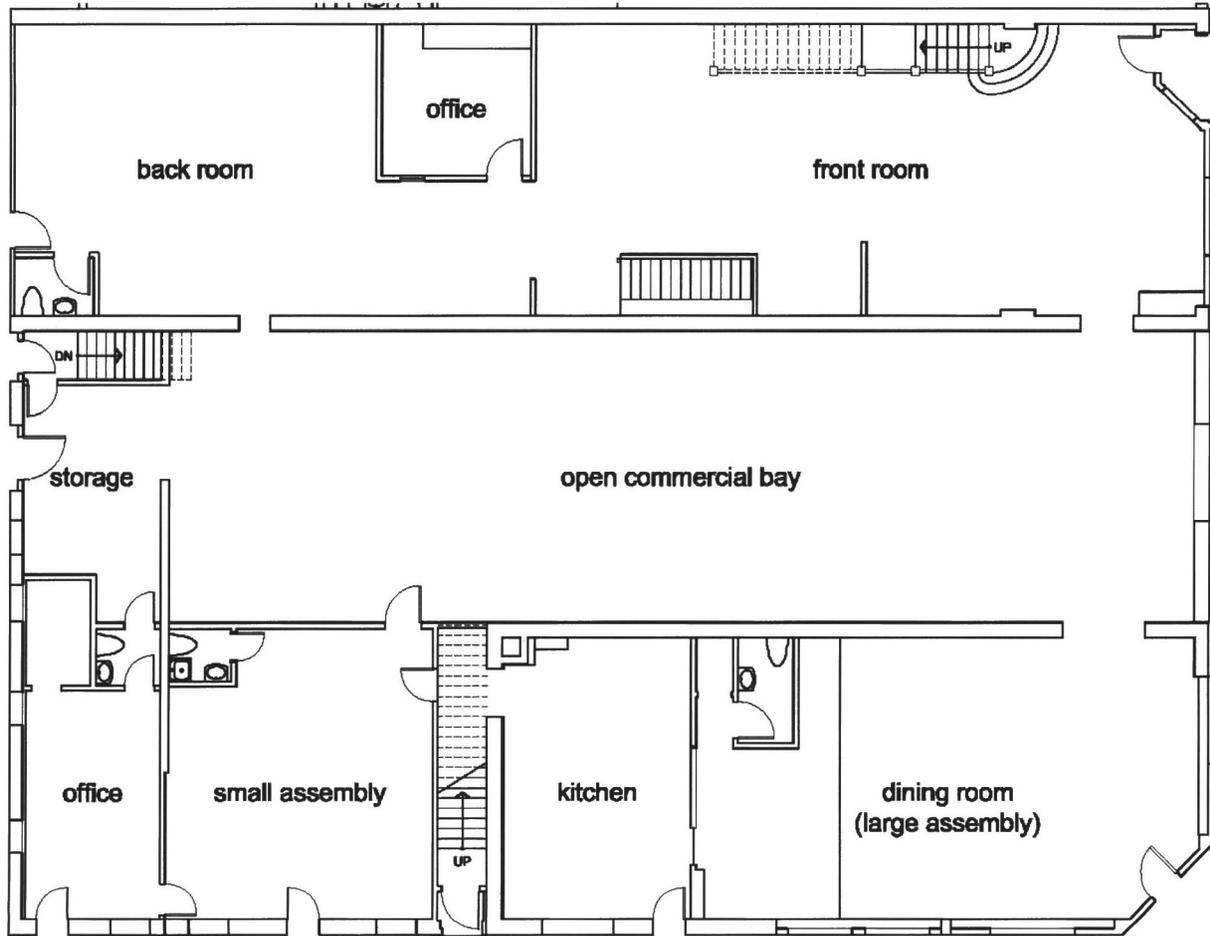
First Floor Plan Pre-Rehabilitation – Plan by APMA March 2010 – not to scale.
